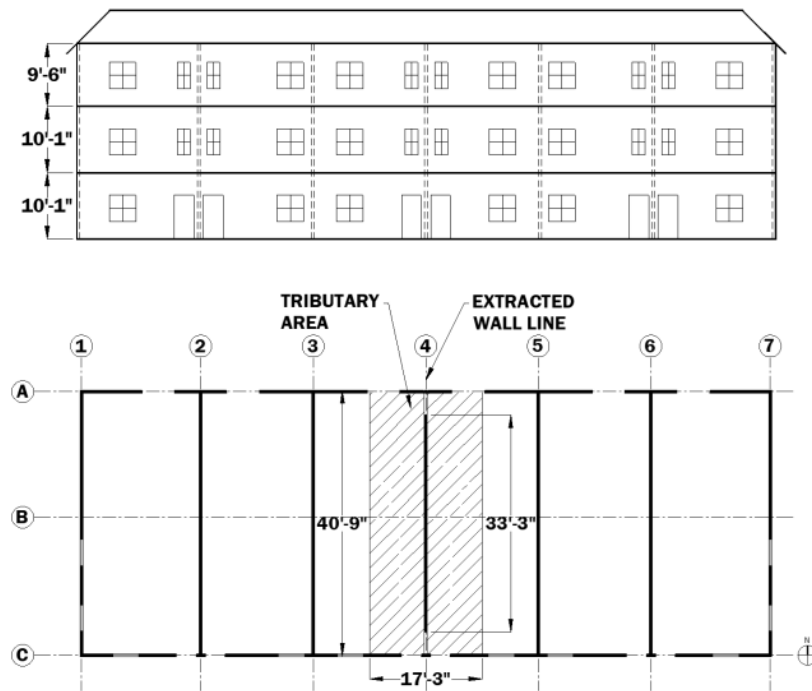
CLT Shear Wall Design Example Building. Top: Elevation. Bottom: Typical Floor Plan Showing Six Townhouse Units
